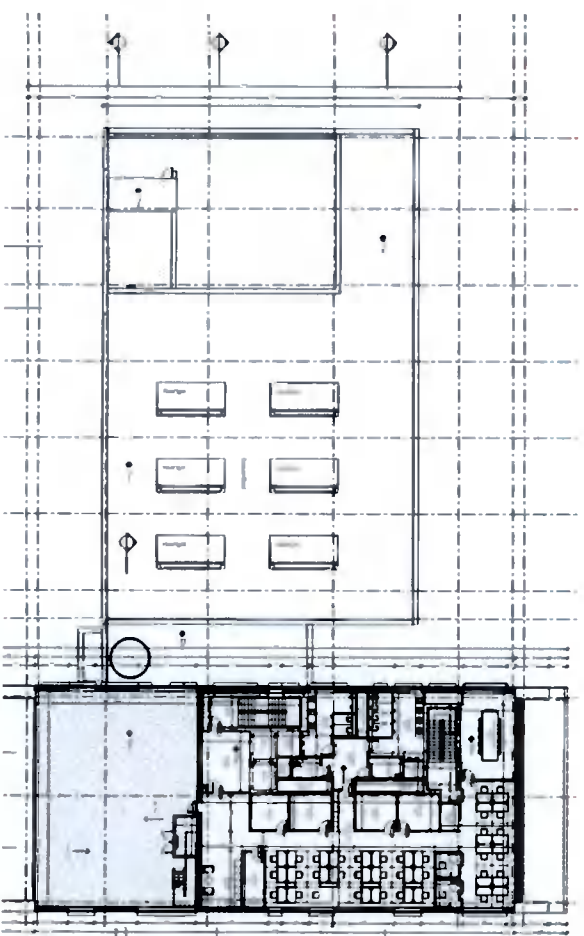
C.A.B. Proposed 3rd Floor Plan (Level 04) (image updated)
